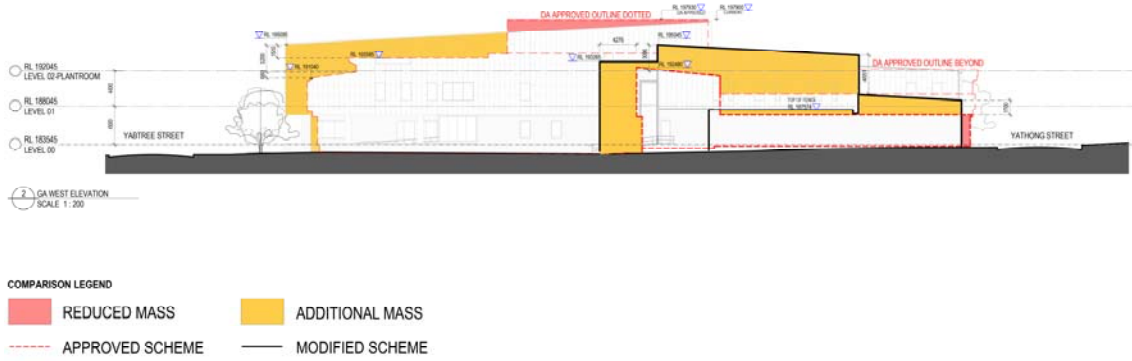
West Elevation comparison drawing (Source: Woods Bagot)
